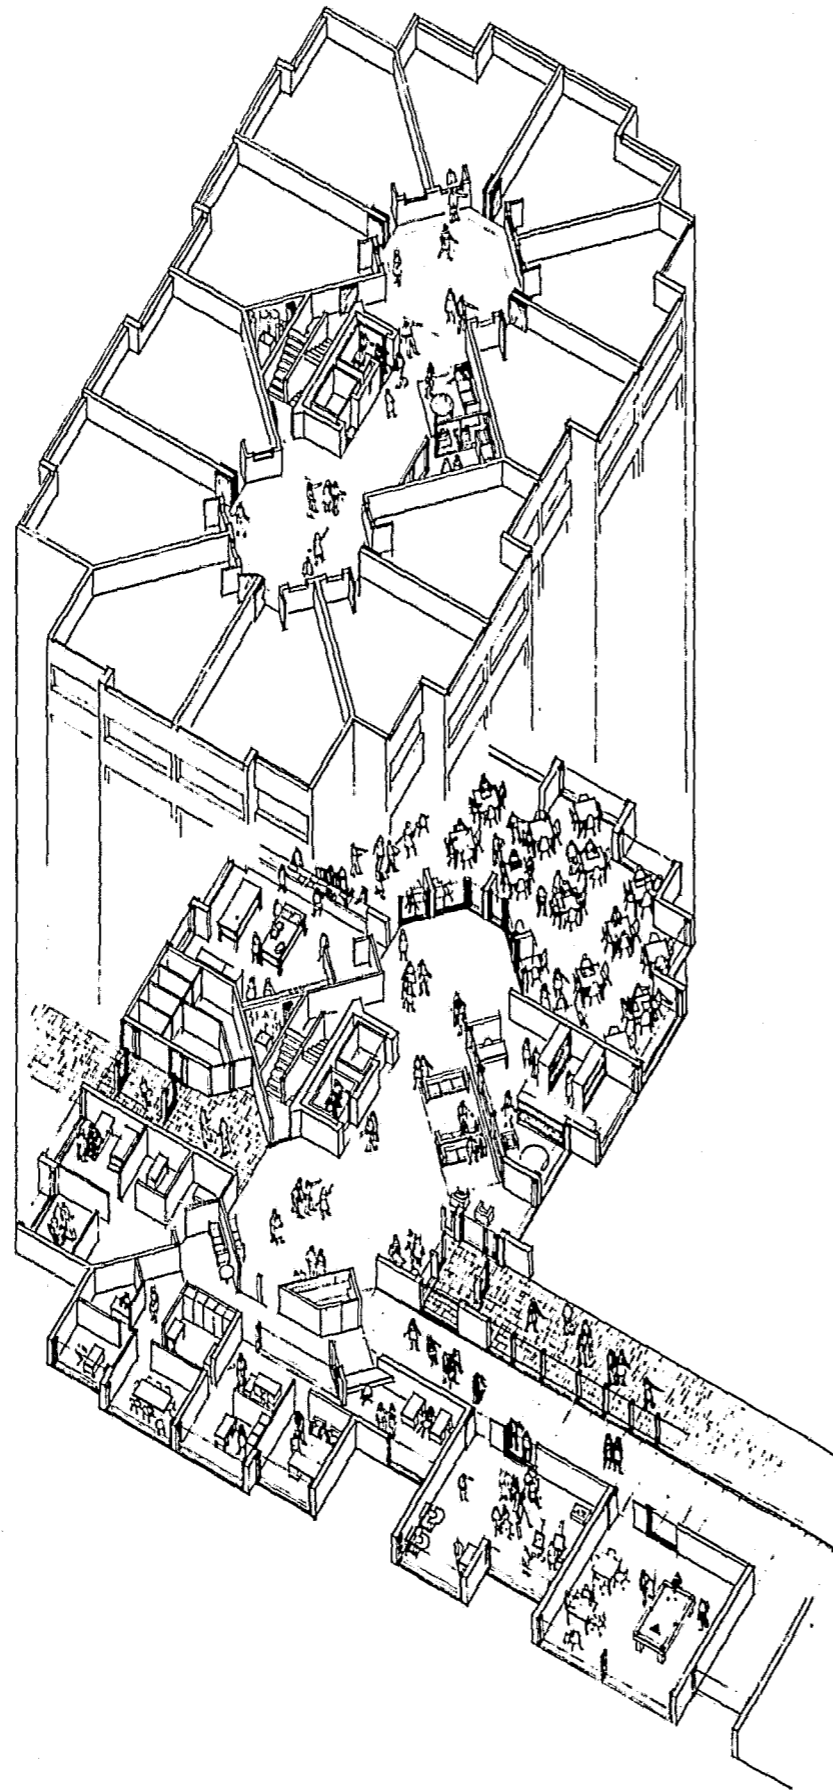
Newark — Isometric drawing of the elderly building, showing interior of ground floor.
